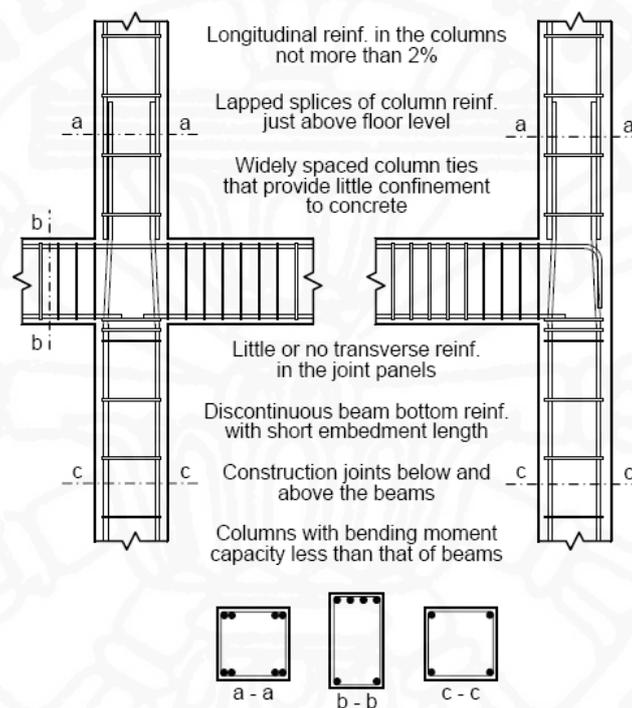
Typical details in under-designed reinforced concrete structures.
